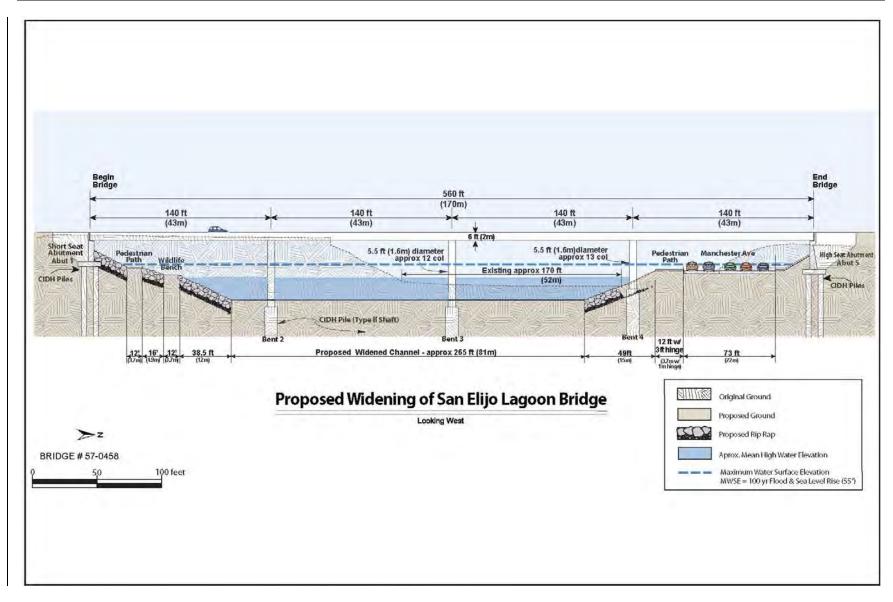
San Elijo Lagoon: Cross-sections for the Existing I-5 Bridge and Proposed 8+4 Buffer
